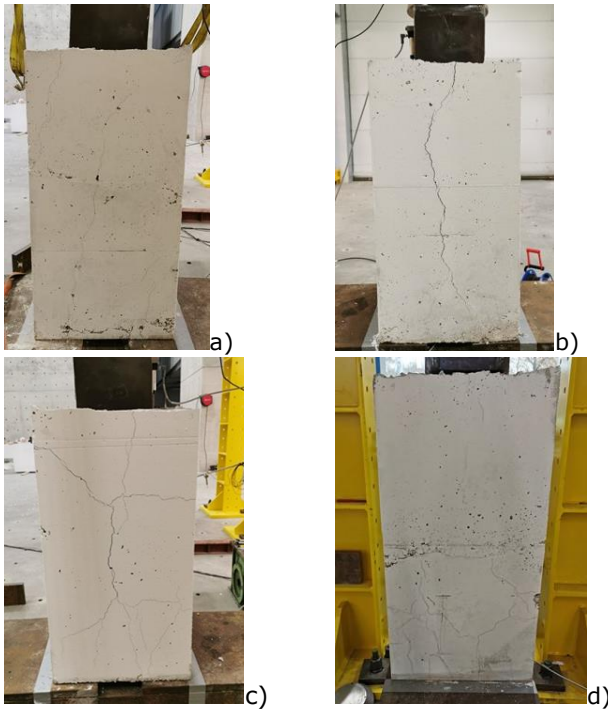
Post failure aspects of the specimens (short-term loading): a) normal surface finishing, b) V-shaped ribs, c) I-shaped ribs, and d) ribbed surface.
